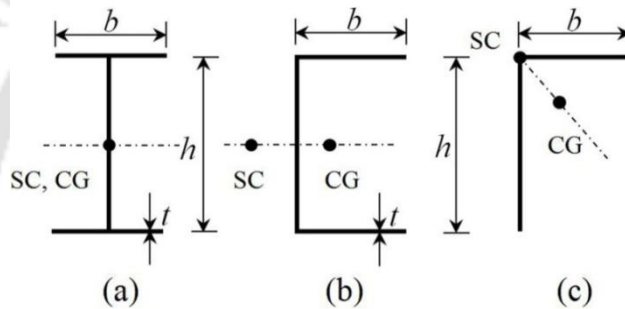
Thin-walled members of variable cross-section: (a) I section; (b) Channel section and (c) Angle section. (SC = shear center; CG = mass center)
